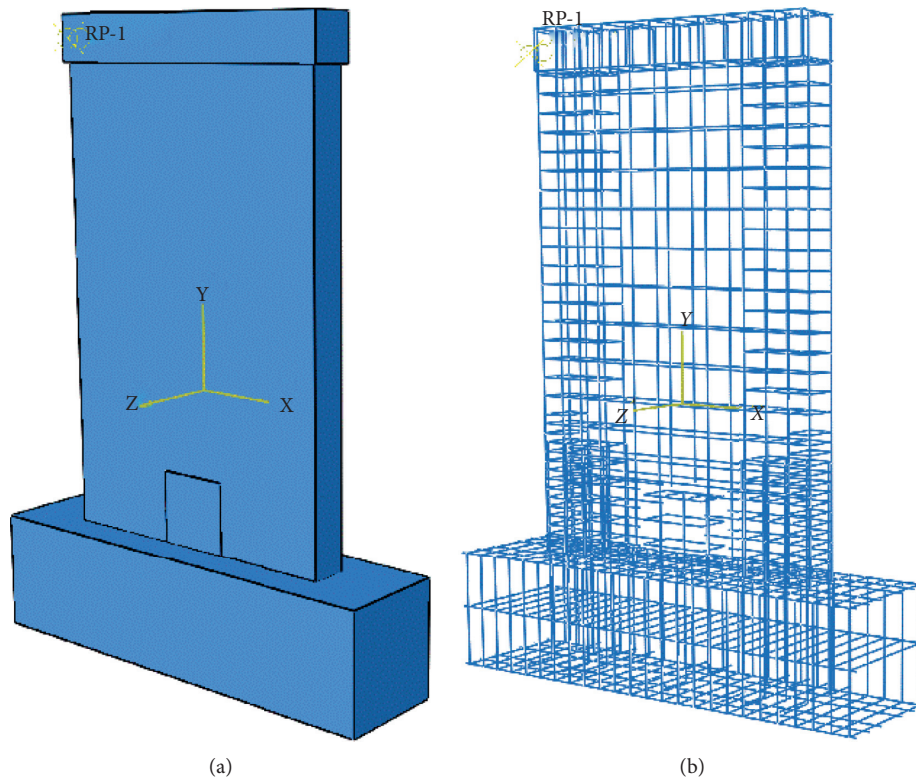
Finite element models: (a) shear wall; (b) reinforcement bars.
